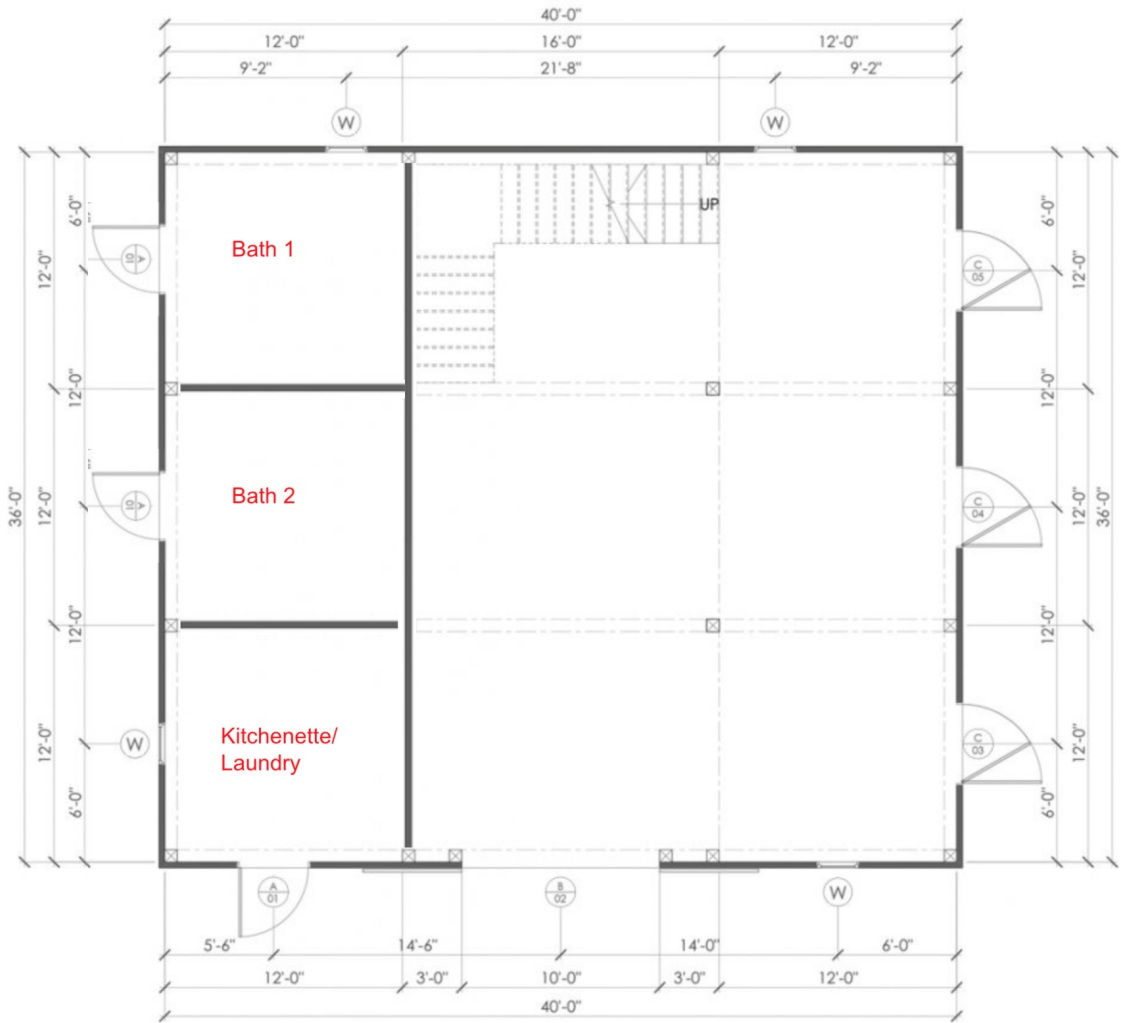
Mixed use SDU (monitor barn) first floor showing guest facilities (red). The remainder of the first floor will serve as barn/storage space
